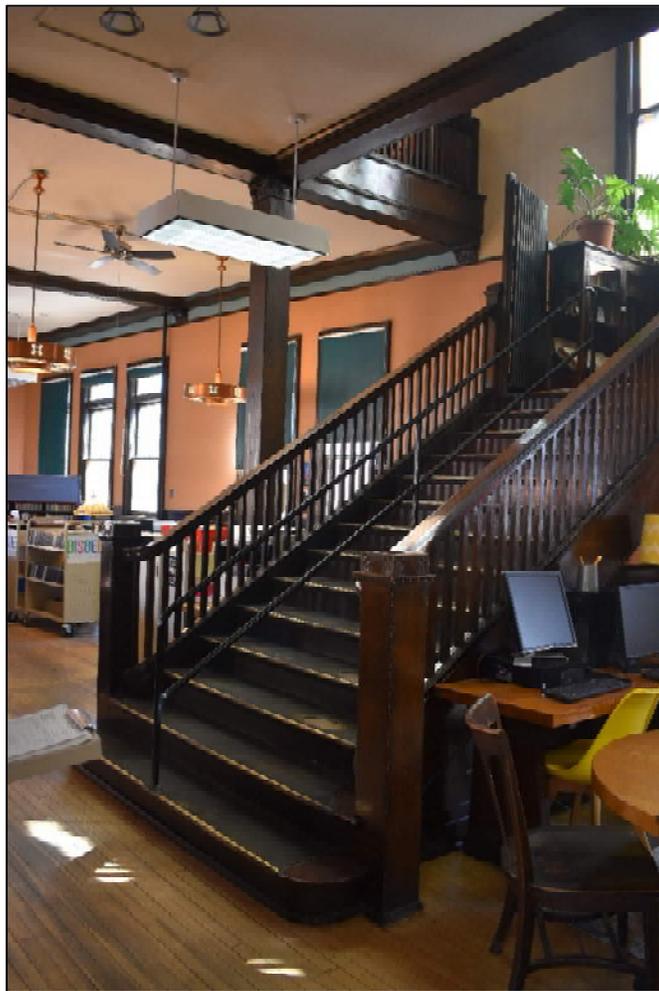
View of newel post, balustrade, stair treads, and risers. March 2021.
